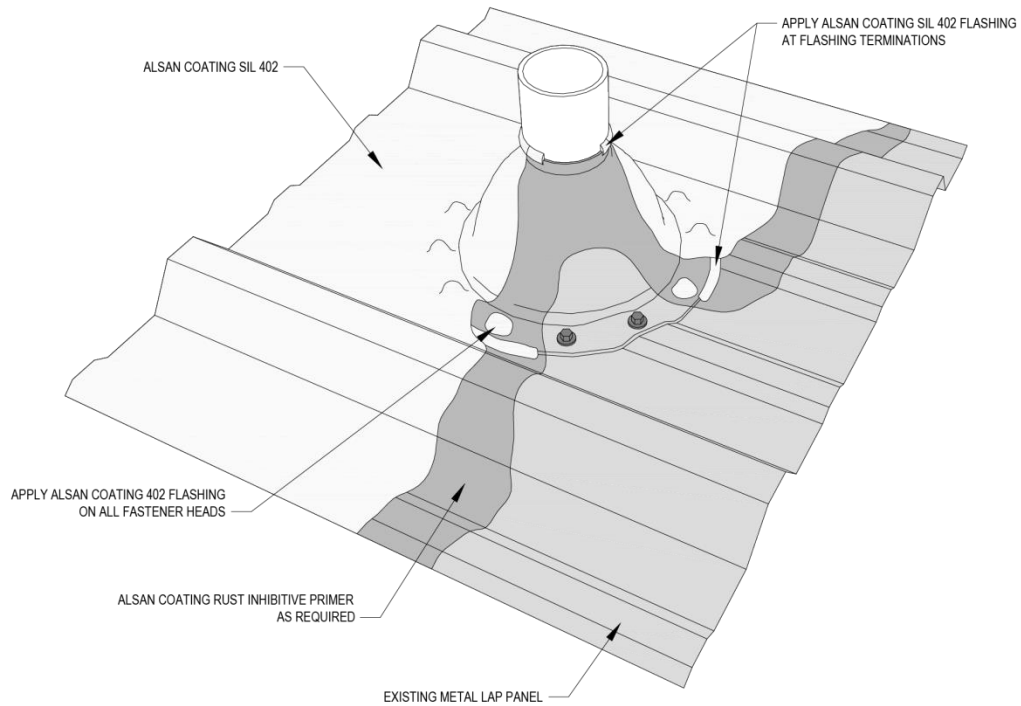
Silicone Roof Coating Over Metal Lap Panels, Penetration
